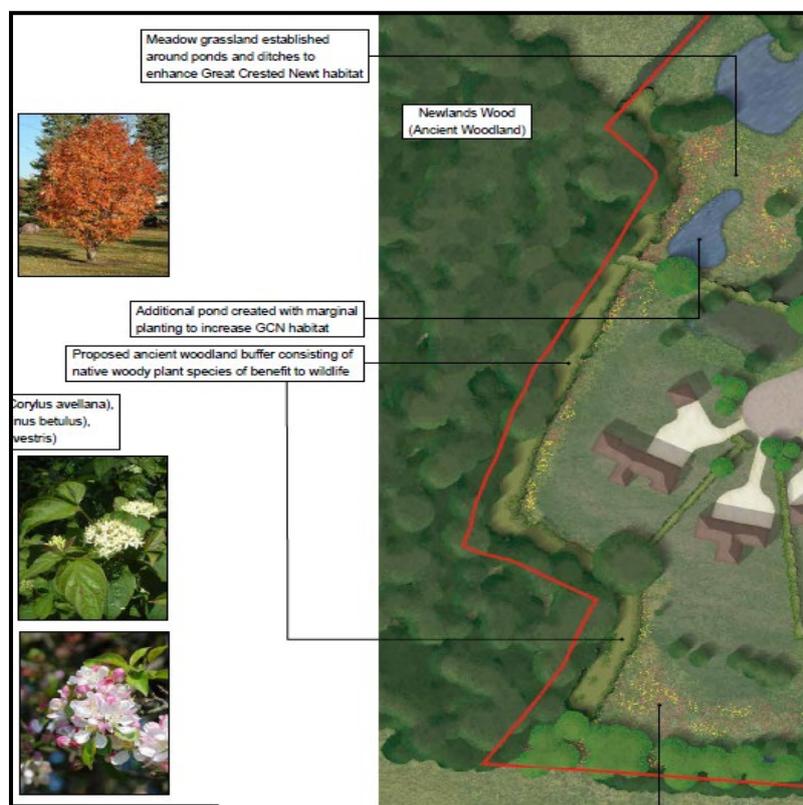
Extract from Landscape Plan showing buffer zone with ancient woodland
